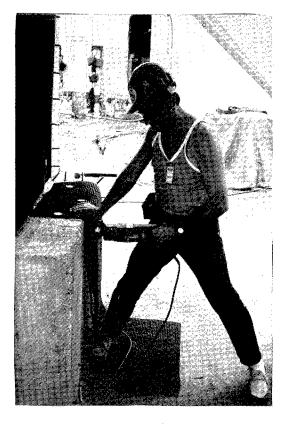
HDPE geonet drainage layer being secured to concrete with small expansion anchors
